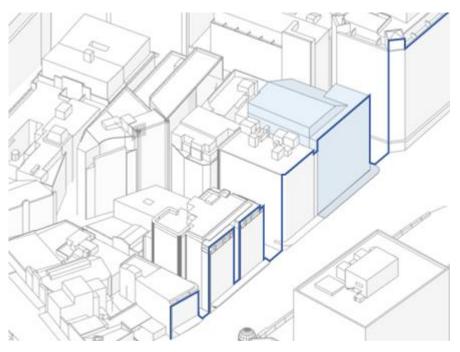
Proposed building envelope – viewed from Elizabeth Street facing north-east
